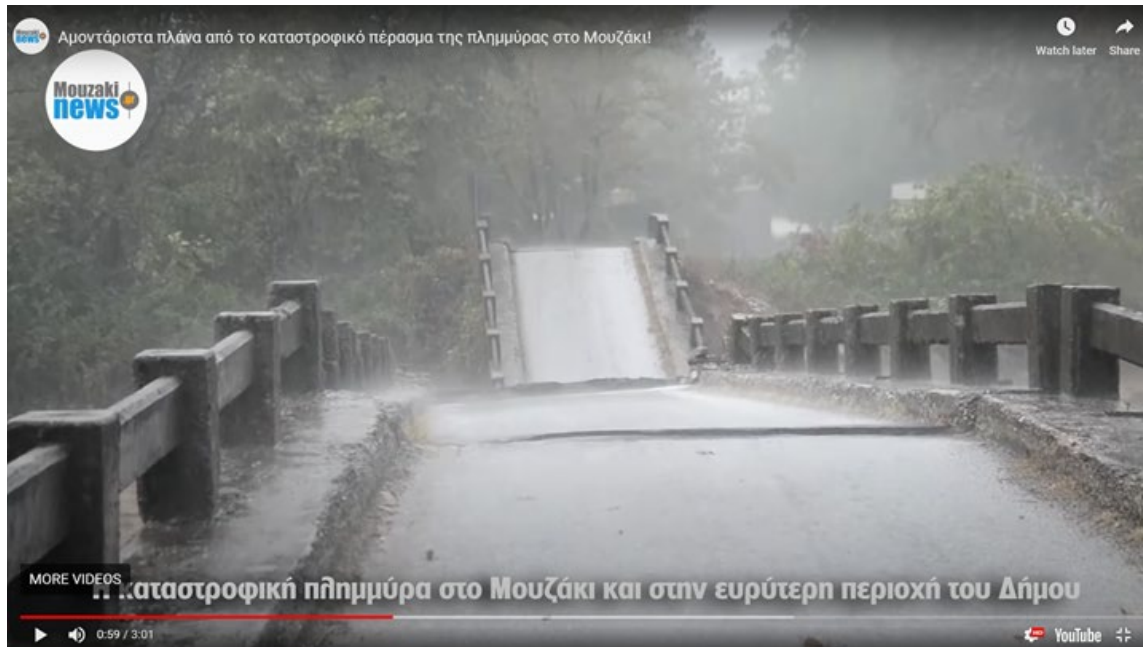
Footage of Bridge No.11 in the local news on September 19, 2020 (source: <https://www.youtube.com/watch?v=hLP3NdMF9SI>).
